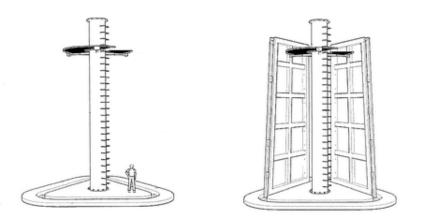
Metallic sectionalised erecting column installed to the foundation, providing support to the flat walls, taken from Cortina-Cordero (2010)
